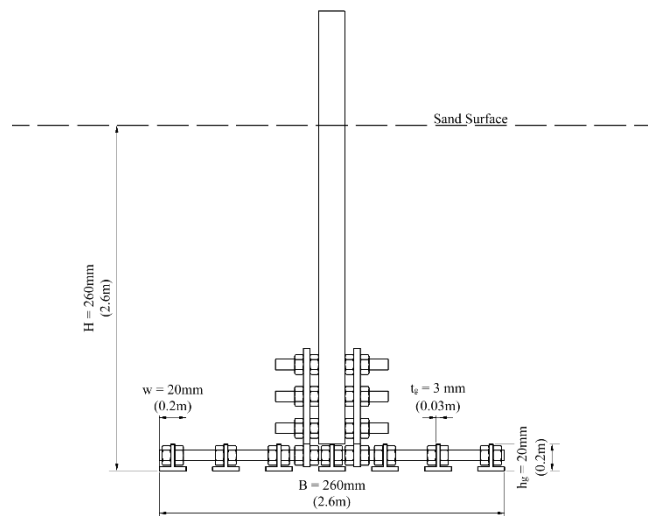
Dimension of assembled 1:10 1g model grillage (prototype dimensions shown in brackets)
